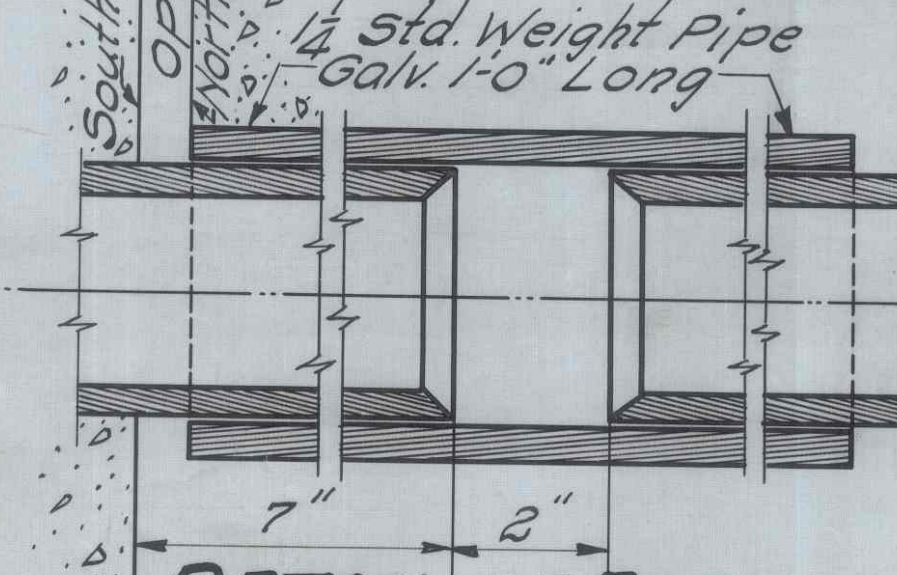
DETAIL ABOVE VOID. SEE REVISED DETAIL SHEET #184.
